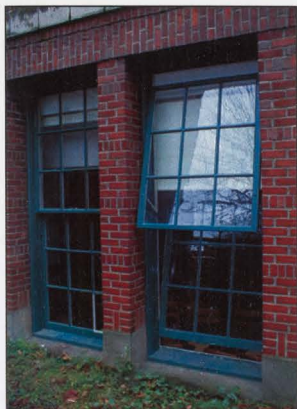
TYPICAL ROTATING AWNING WINDOWS
